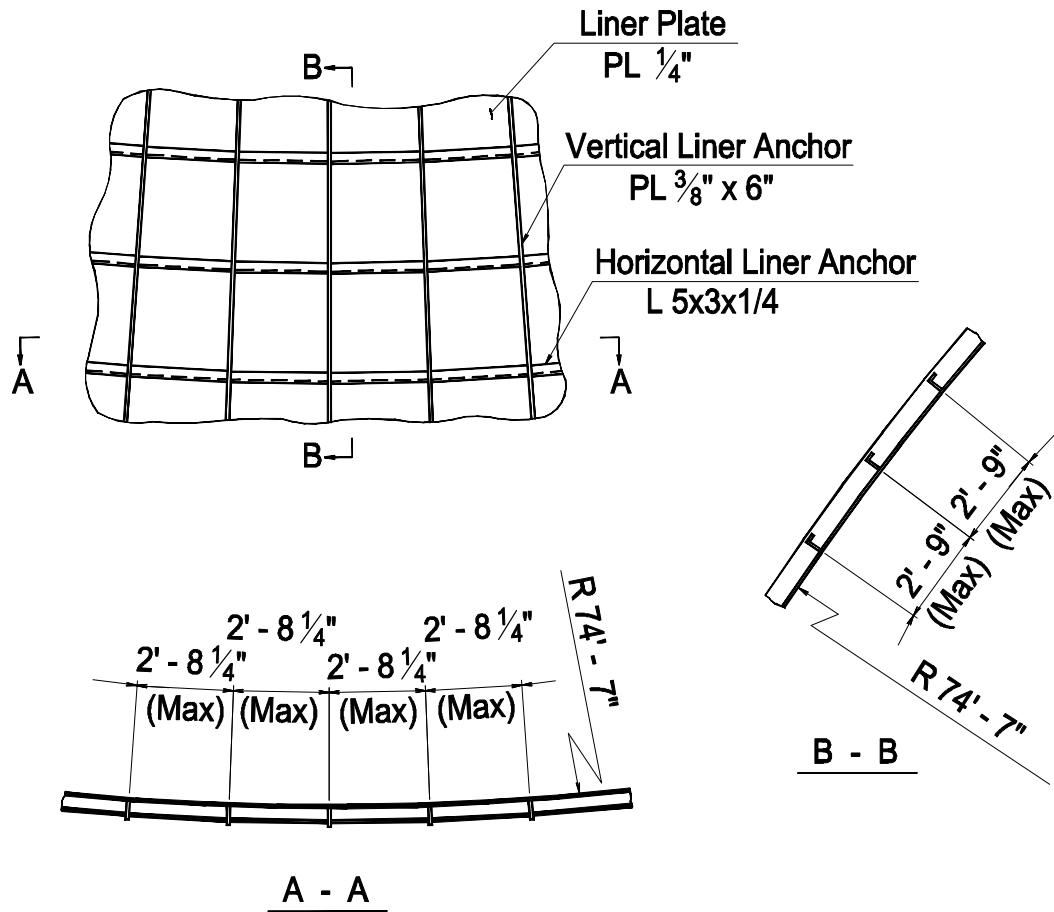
Liner Anchorage System for the Upper Portion of Dome
